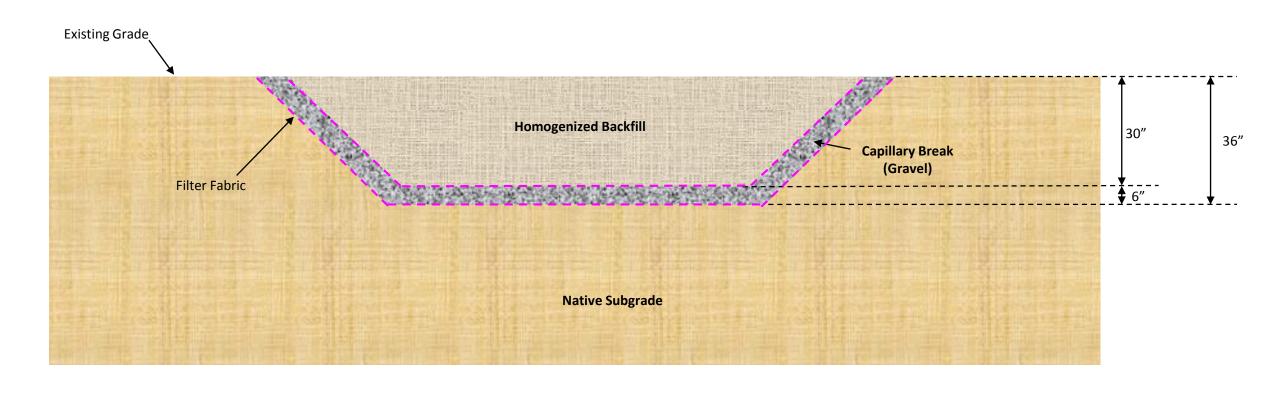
Plan View of Proposed Test Plots Drawing 02 Cross Sections of Proposed Test Plots
